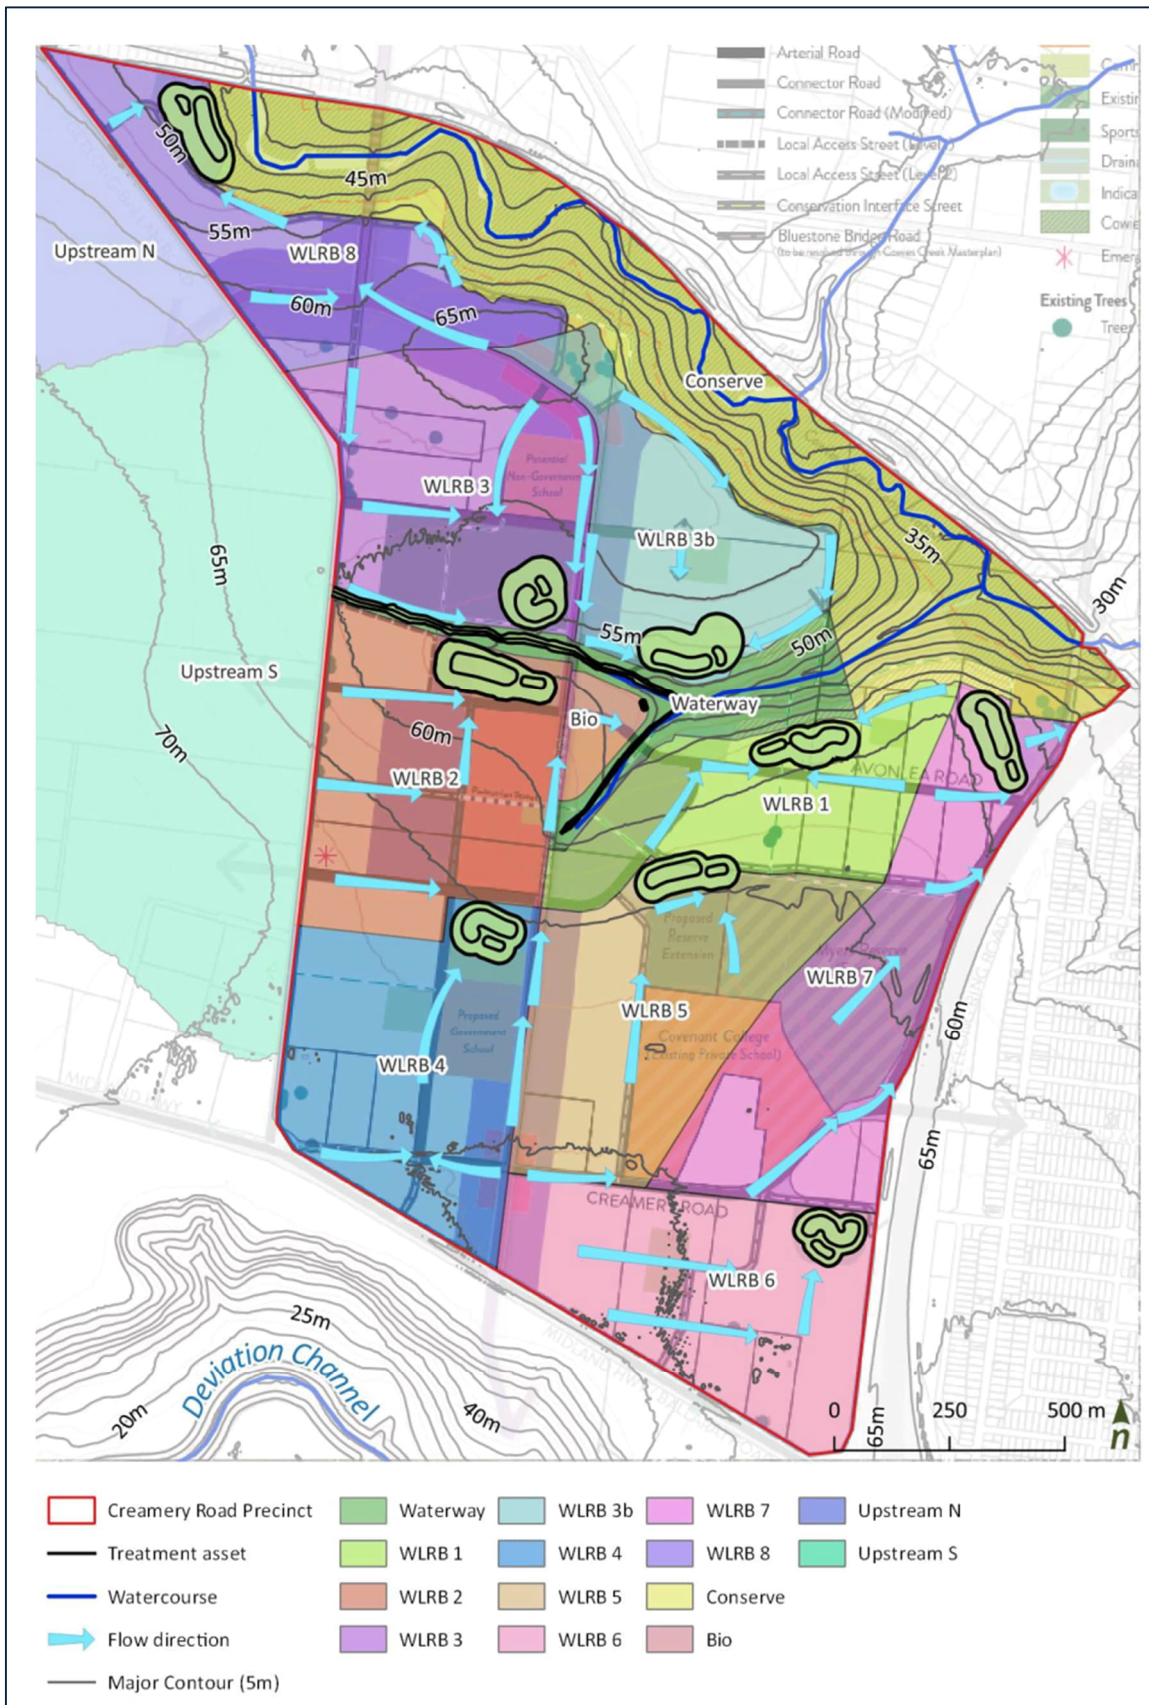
Creamery Road precinct – Integrated Retarding Basin & Treatment Wetland (WLRB) Plan Overview
